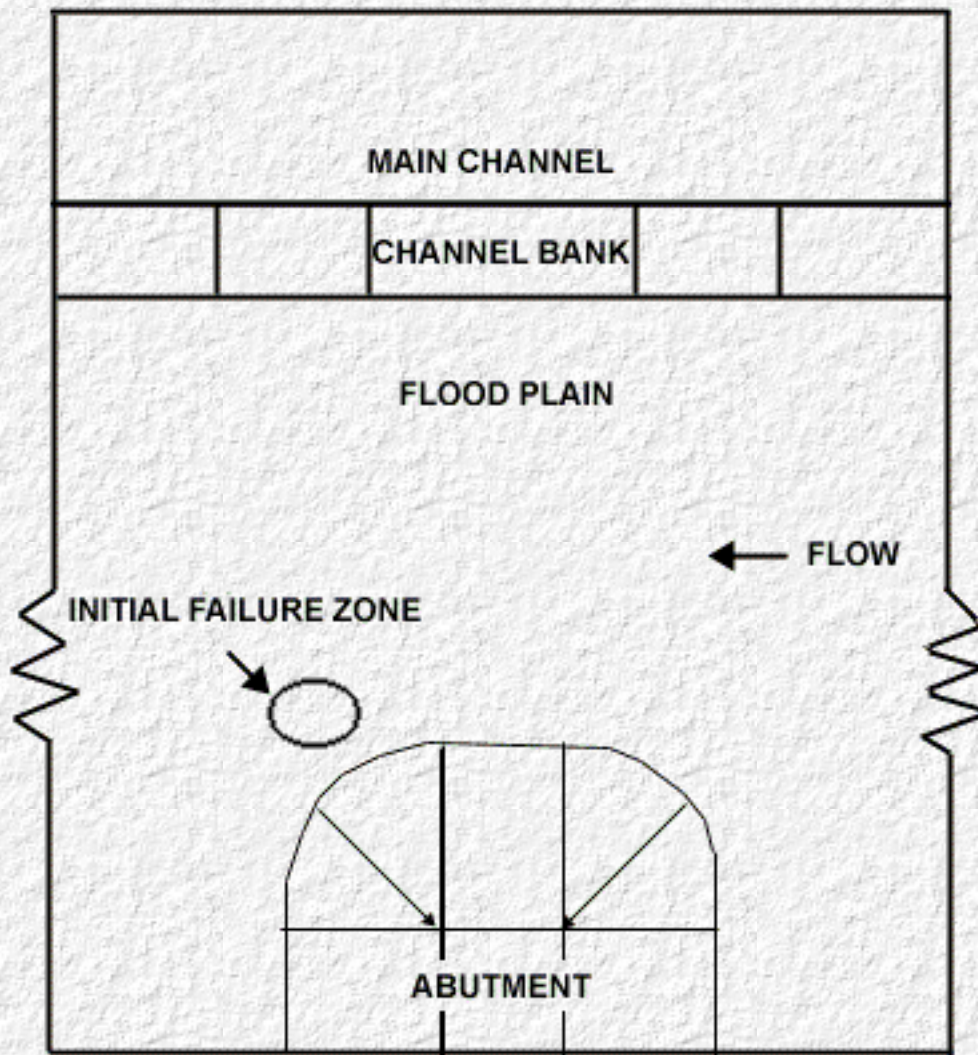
Plan View of the Location of Initial Failure Zone of Rock Riprap for Spill-Through Abutment (80, 81)
